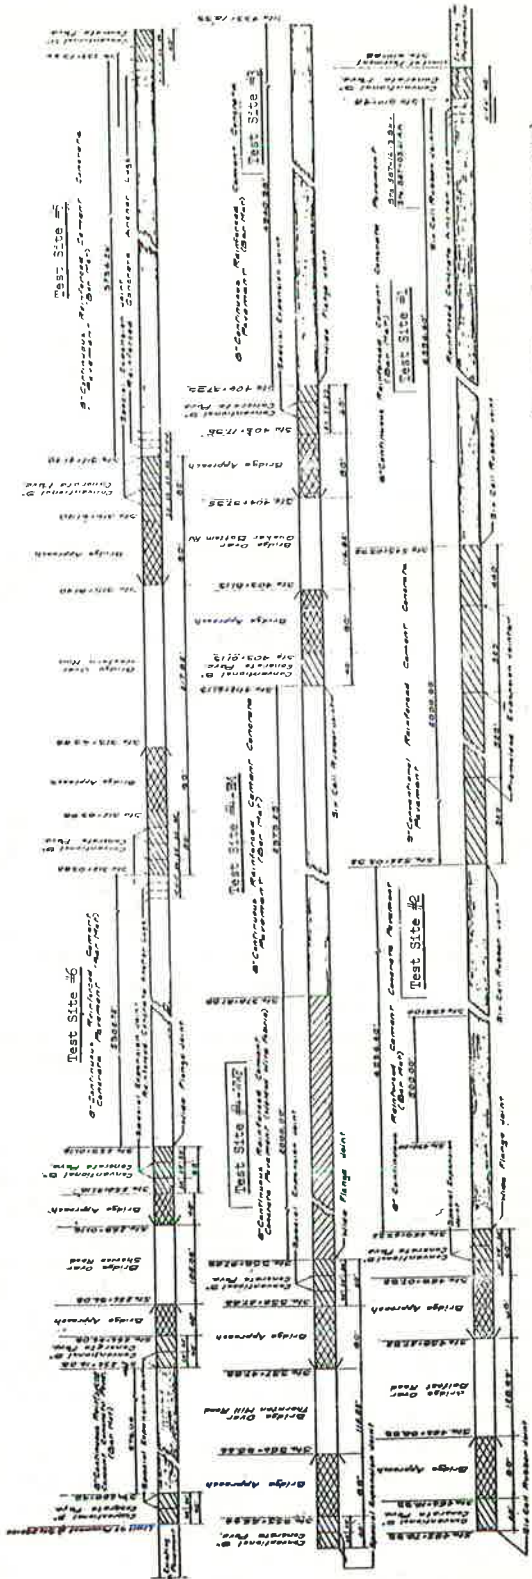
Proposed pavement layout of Interstate I-83—Baltimore-Harrisburg Expressway (Southbound Roadway only).
